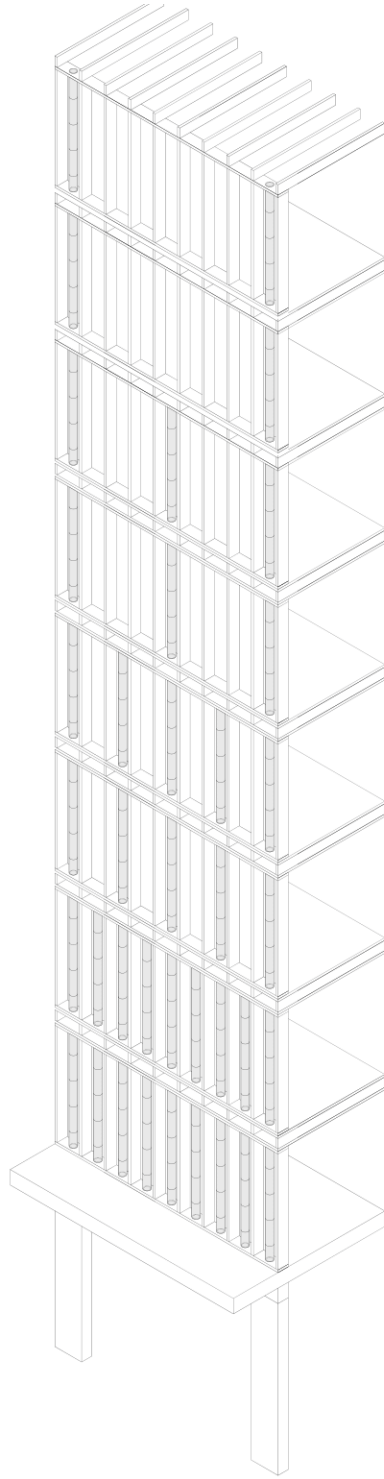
Multi-storey hybrid bamboo panel frame system with adaptable reinforcement column and concrete base.
